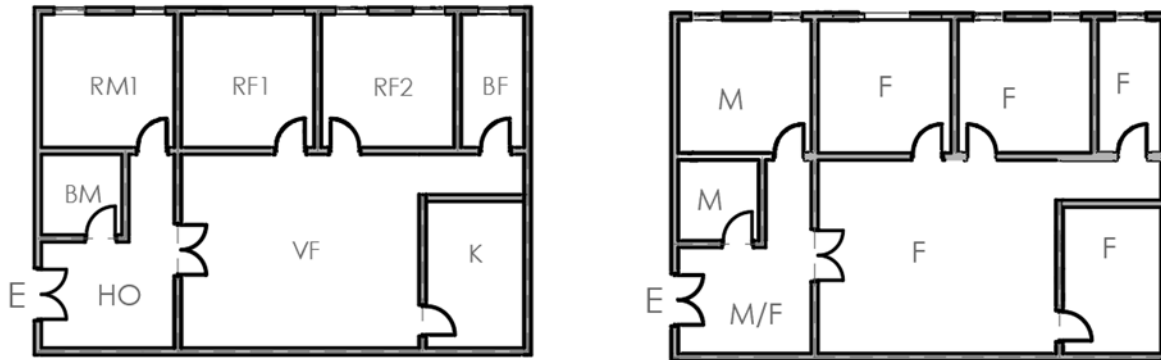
Case 4 - Layout Plan and the Male & Female Domains Layout
